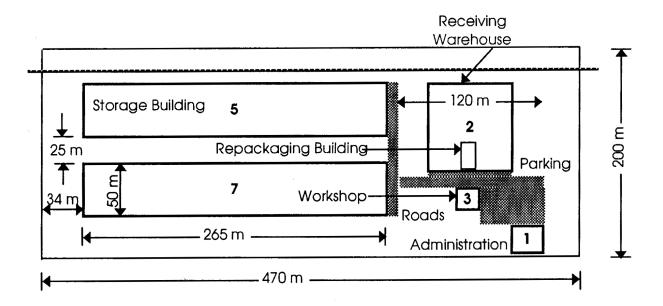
Site Layout of the Building Storage Facility — Uranium Metal, 25% Case
